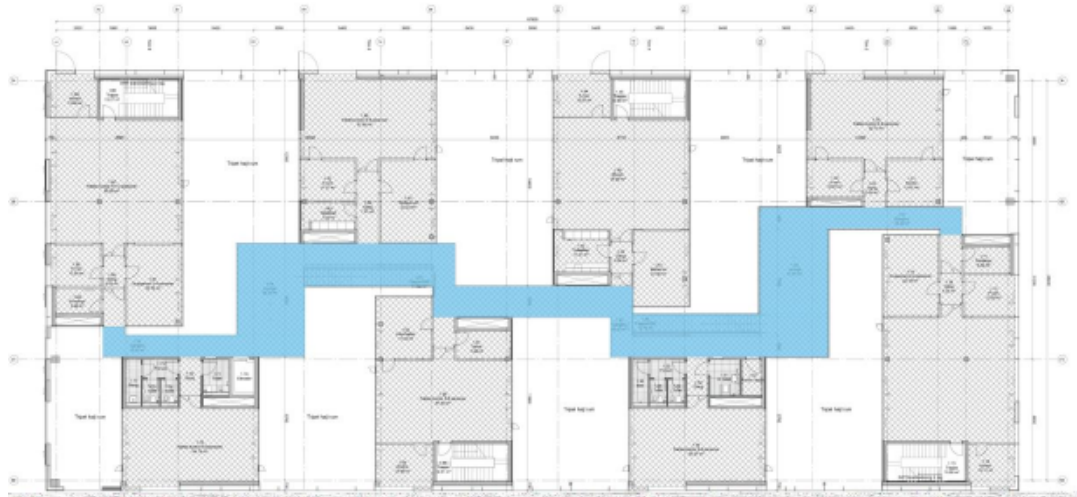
Plan solution for first floor. The bridge structure hanging from the roof is marked with blue.
